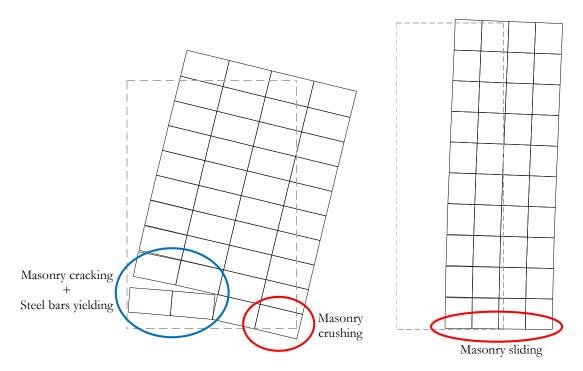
Numerical deformed shape registered at the end of the test for the W2 wall (left) and W4 wall(right), considering an amplification factor of 10.
